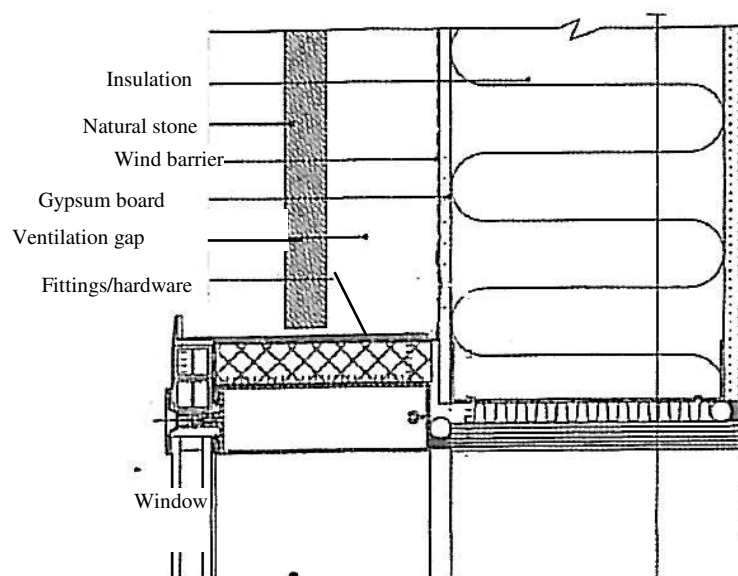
Example of combination of one- and two-stage tightening. Horizontal cross-section of the connection between a wall and a window.
